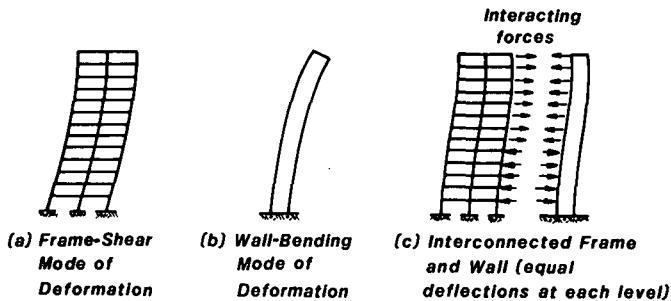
Deflected Shapes and Interaction of Frames and Walls
